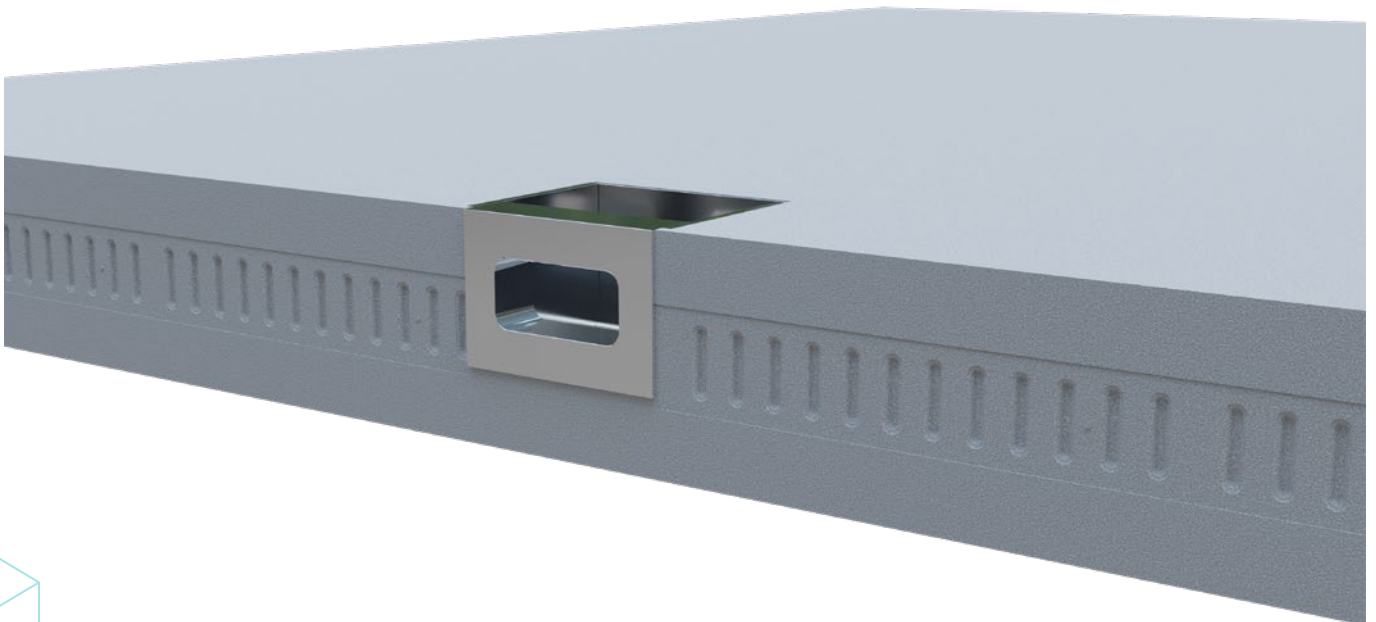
GRIP STAYS AT SAME POSITION AFTER REMOVING OF CONCRETE PRECAST ELEMENT. IT CAN BE USED AGAIN AFTER CLEANING OF THE SURFACE FROM CONCRETE DEBRIS.
